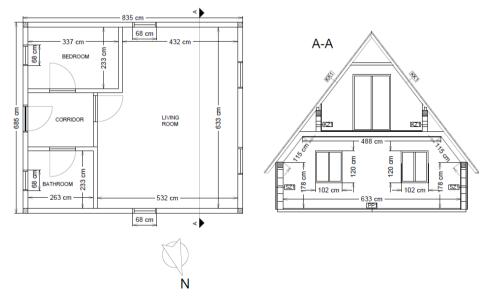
Ground floor plan and vertical section A-A of the weekend cottage
